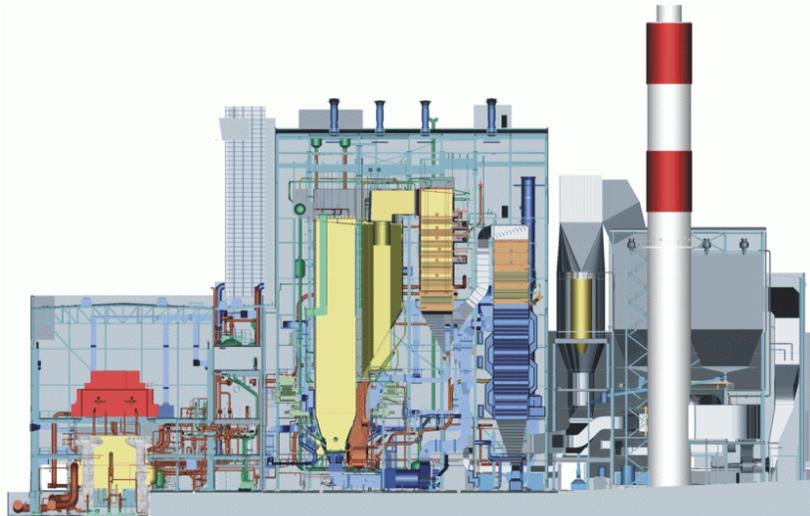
A Cross section layout drawing of the ESB's new CFB based power plant
